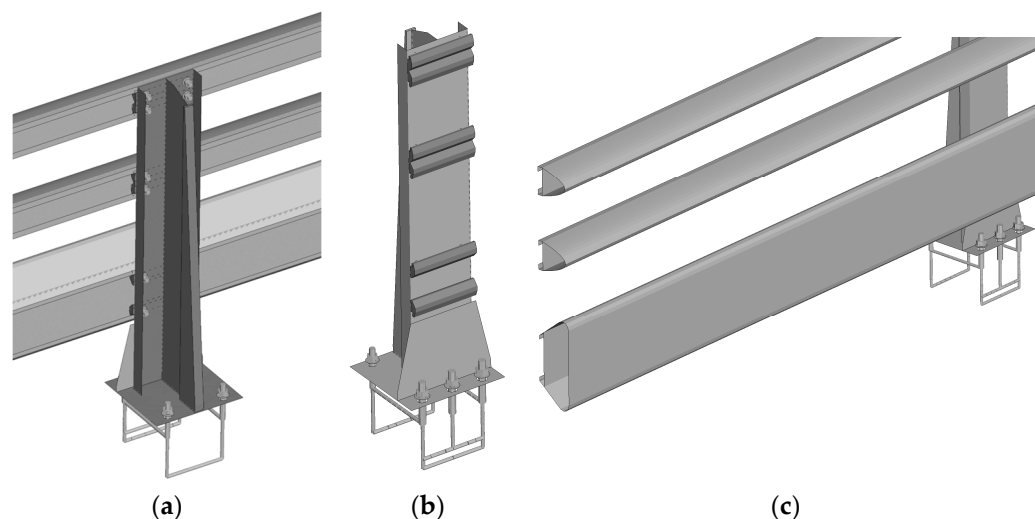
Rail–post assembly of TMBR: (a) Rear view; (b) front view of the post without rails; (c) front view of rails.
